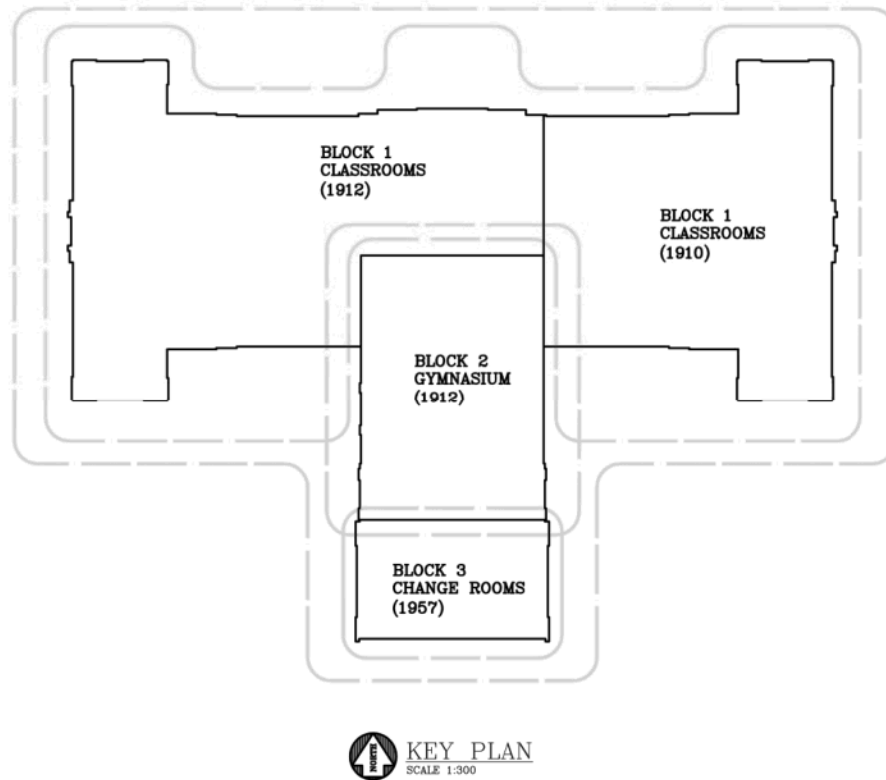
Key Plan for Lord Tennyson Elementary School
